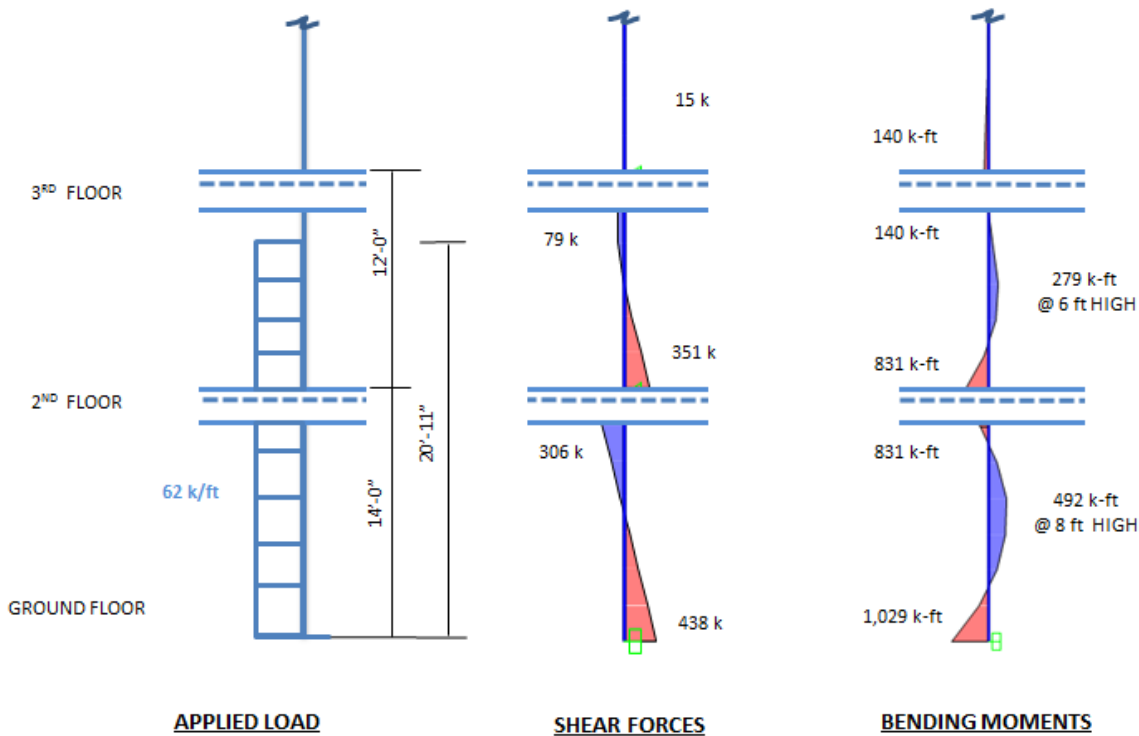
Hydrodynamic loading on exterior column of the Seaside office building due to Load Case 2
